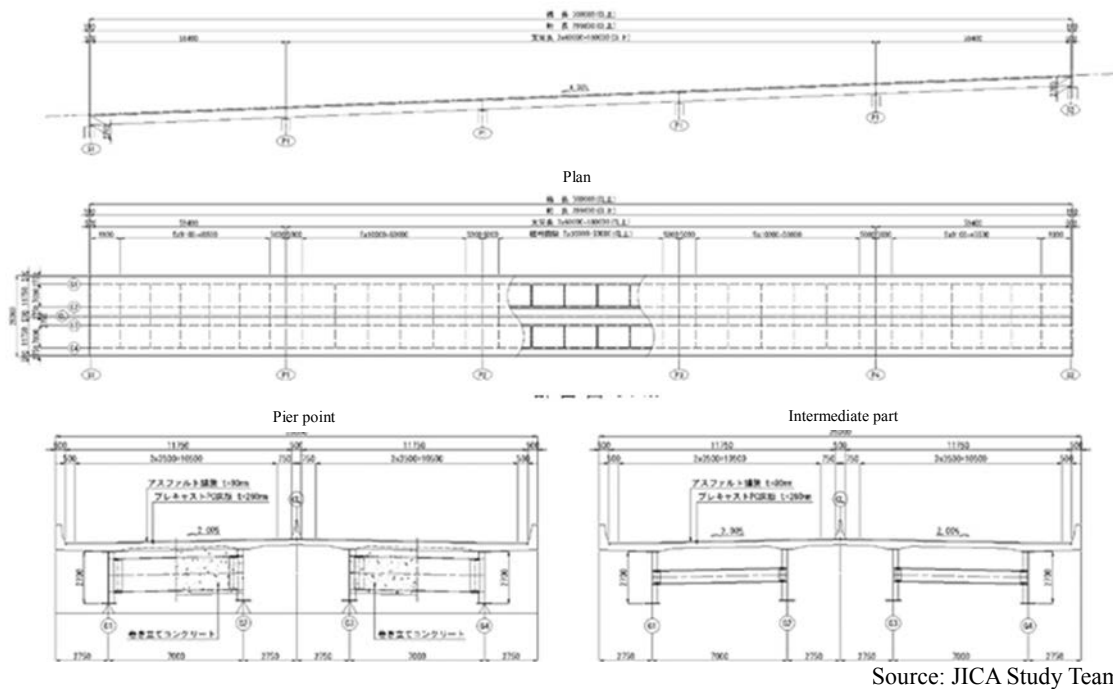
Steel Continuous Double Main I-Girder Bridge/General Drawing
